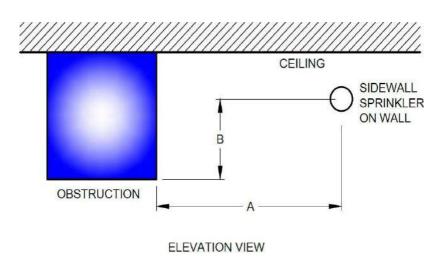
SIDEWALLSPRINKLERFACINGOBSTRUCTION
